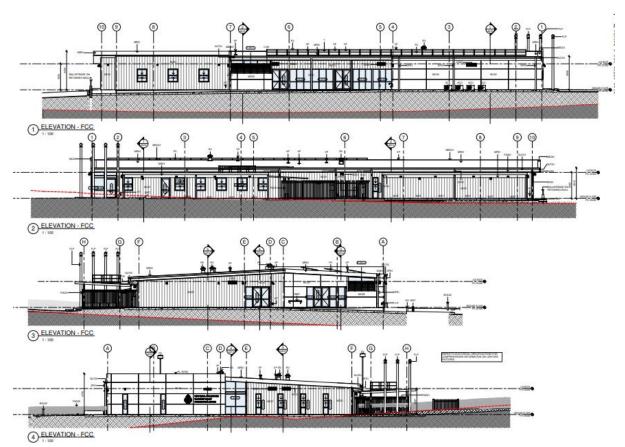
Fire Control Centre Elevations NBRS & Partners 28 September 2023
